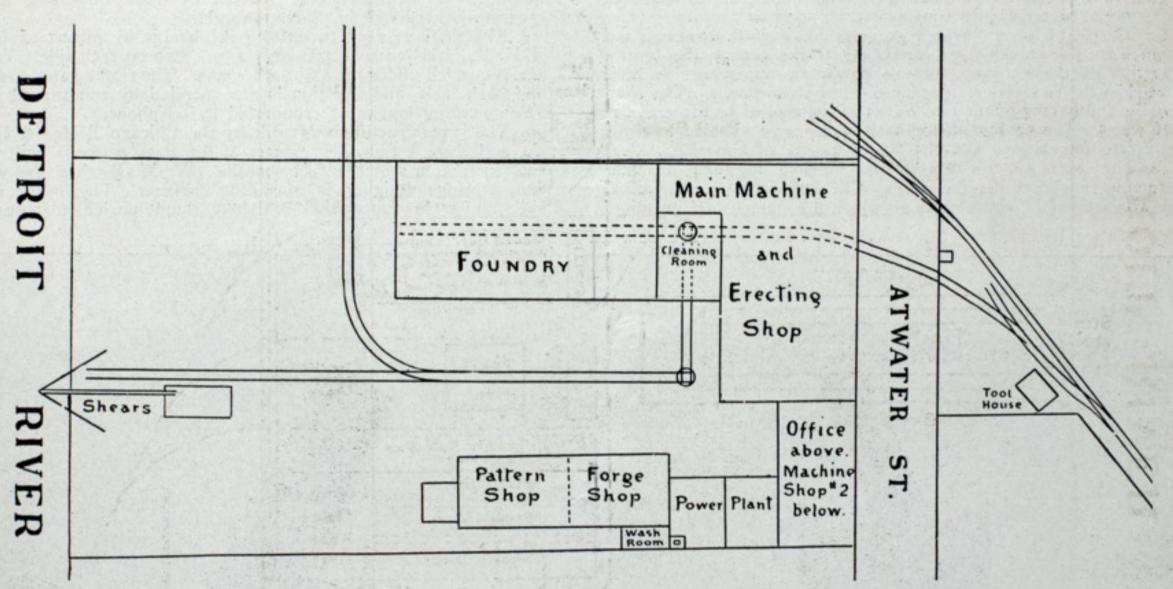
Plan of the Machine Shops and Foundry of the Great Lakes Engineering Works, Detroit, Mich.
